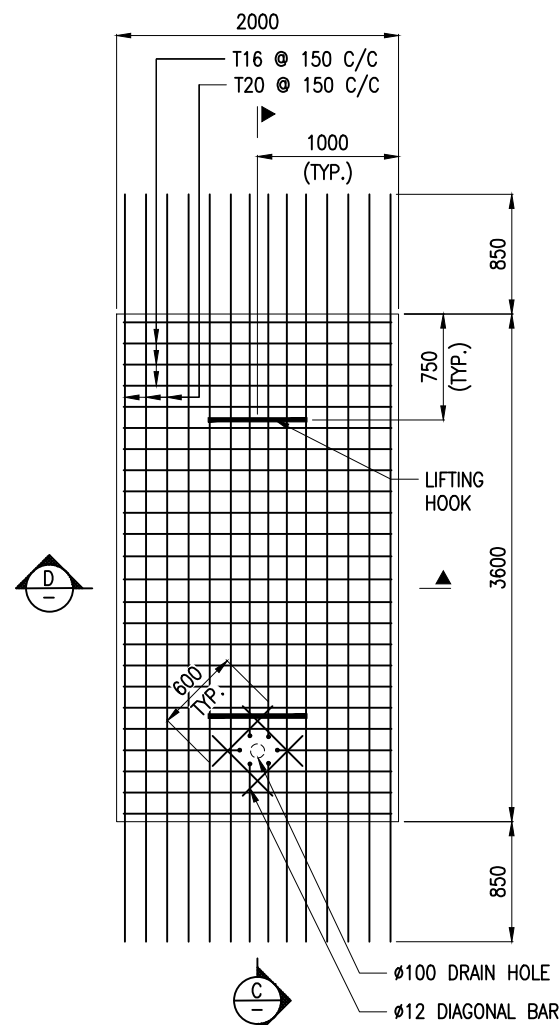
DETAILS OF PRECAST SLAB P1,P3,P4,P5,P6,P7
